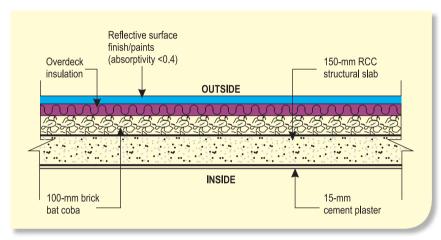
Typical section of the roof showing overdeck insulation and reflective surface finish
